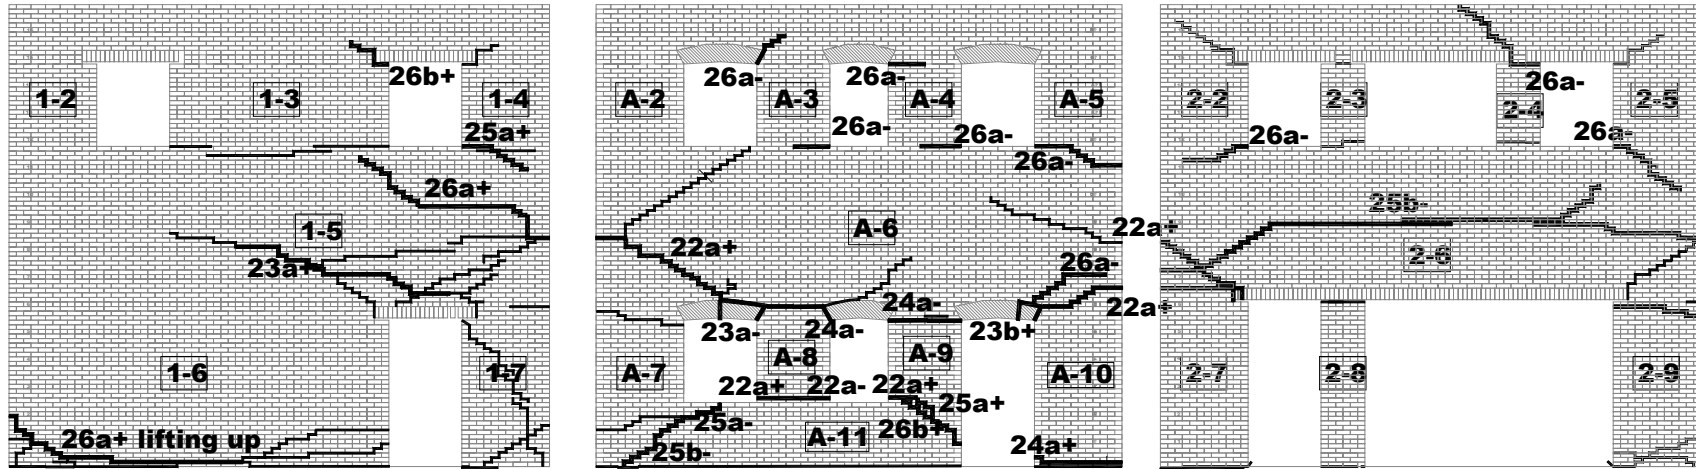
Crack pattern of Wall A and adjacent Wall 1 (left) and Wall 2 (right) at the end of Cycle 26b. The crack number corresponds to the test run number. Number IDs of each pier are given in the rectangles.
